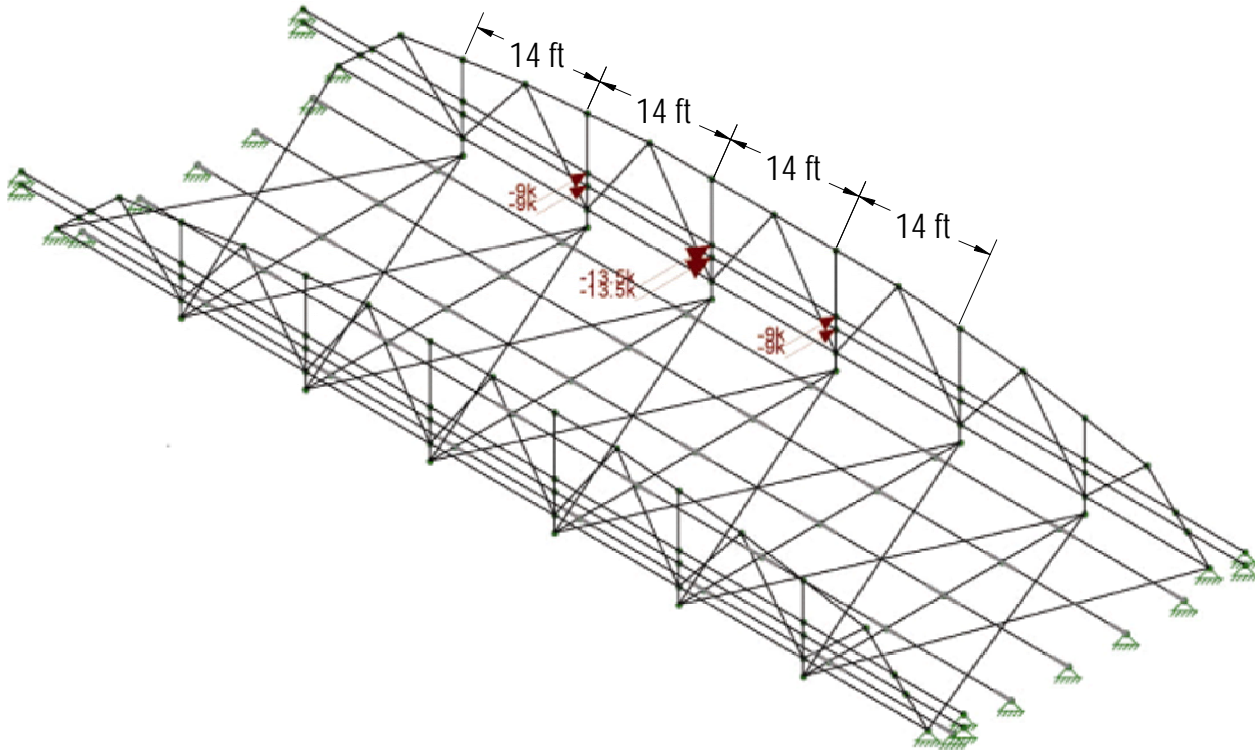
Superimposed Crash Loads from New Truss-Mounted Bridge Rail for Deer Creek Bridge Analysis.
